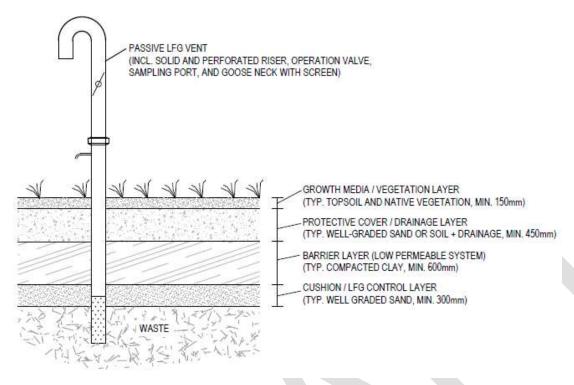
Drawing detail for typical low-permeable system with compacted clay.
